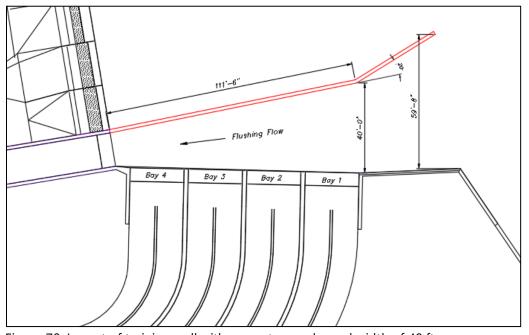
Layout of training wall with an upstream channel width of 40 ft.
